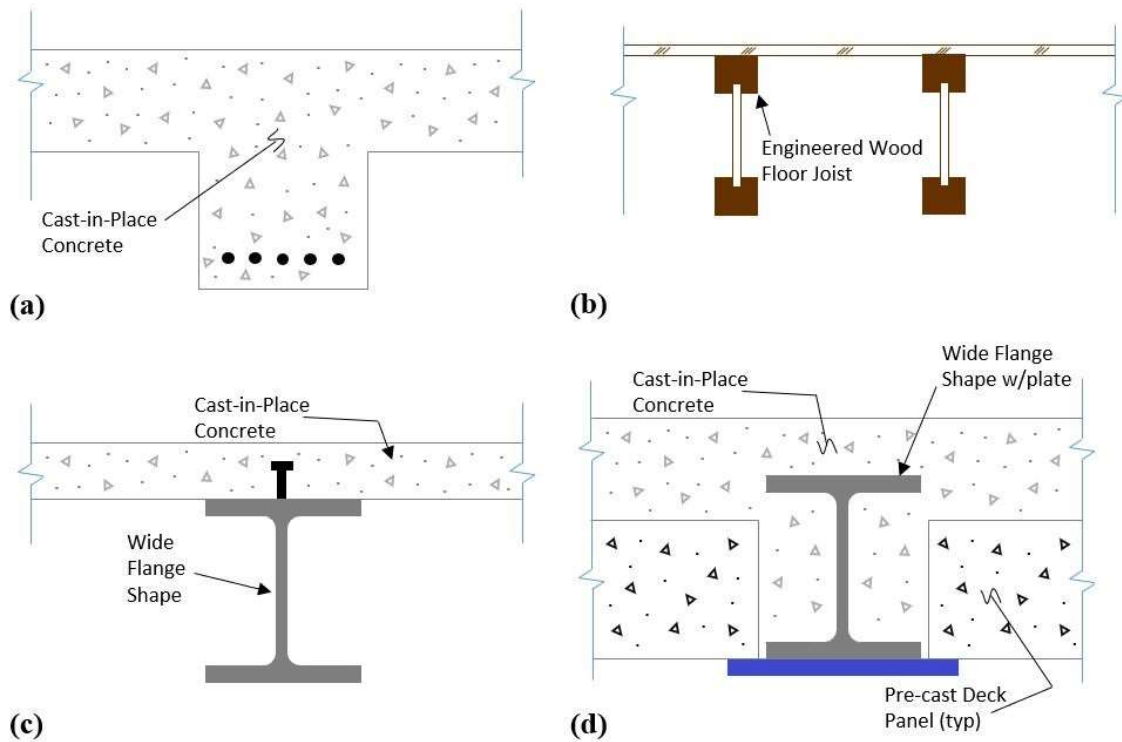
Typical residential/light commercial flooring systems. (a) Typical cast-in-place concrete floor, (b) Engineered wood flooring system, (c) Steel hot-roll beams with cast-in-place slab, and (d) Steel beams supporting pre-cast concrete panels with a cast-in-place topping slab.
